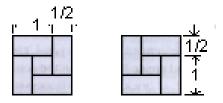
c: 1 1/2 X 1 1/2 Brick column
